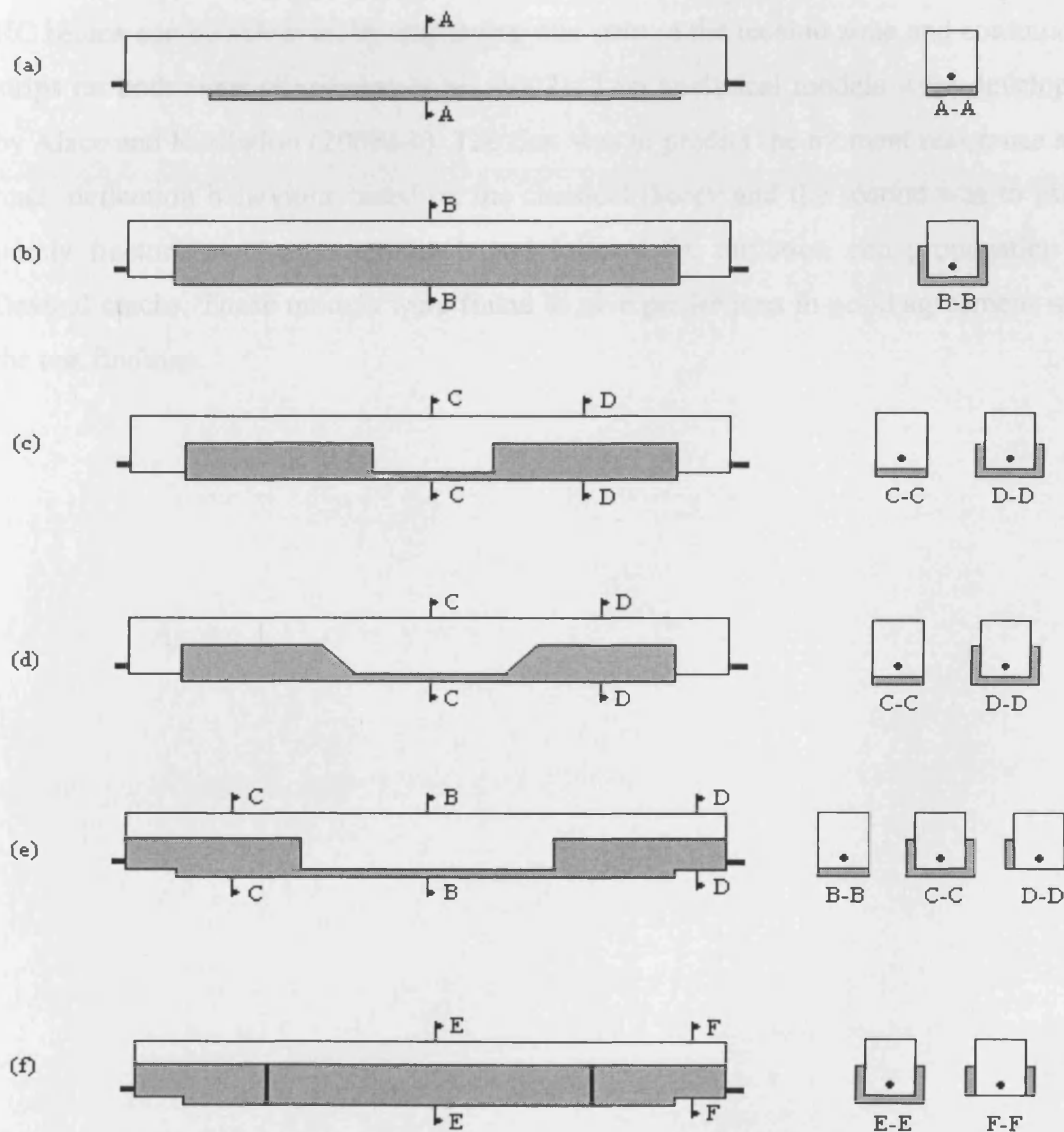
Configurations of retrofitting RC beams with CARDIFRC[®] : (a) beam retrofitted with one strip on tension side; (b) beam retrofitted with one strip underneath and two side strips; (c) beam retrofitted with one strip underneath and four rectangular side strips; (d) beam retrofitted with one strip underneath and four trapezoidal side strips; (e) one strip bonded on tension face and four short strips on vertical sides covering supports and ends of tension strip; and (f) one strip bonded on tension face and four short and two continuous strips on vertical sides, fully covering supports and tension strip sides
